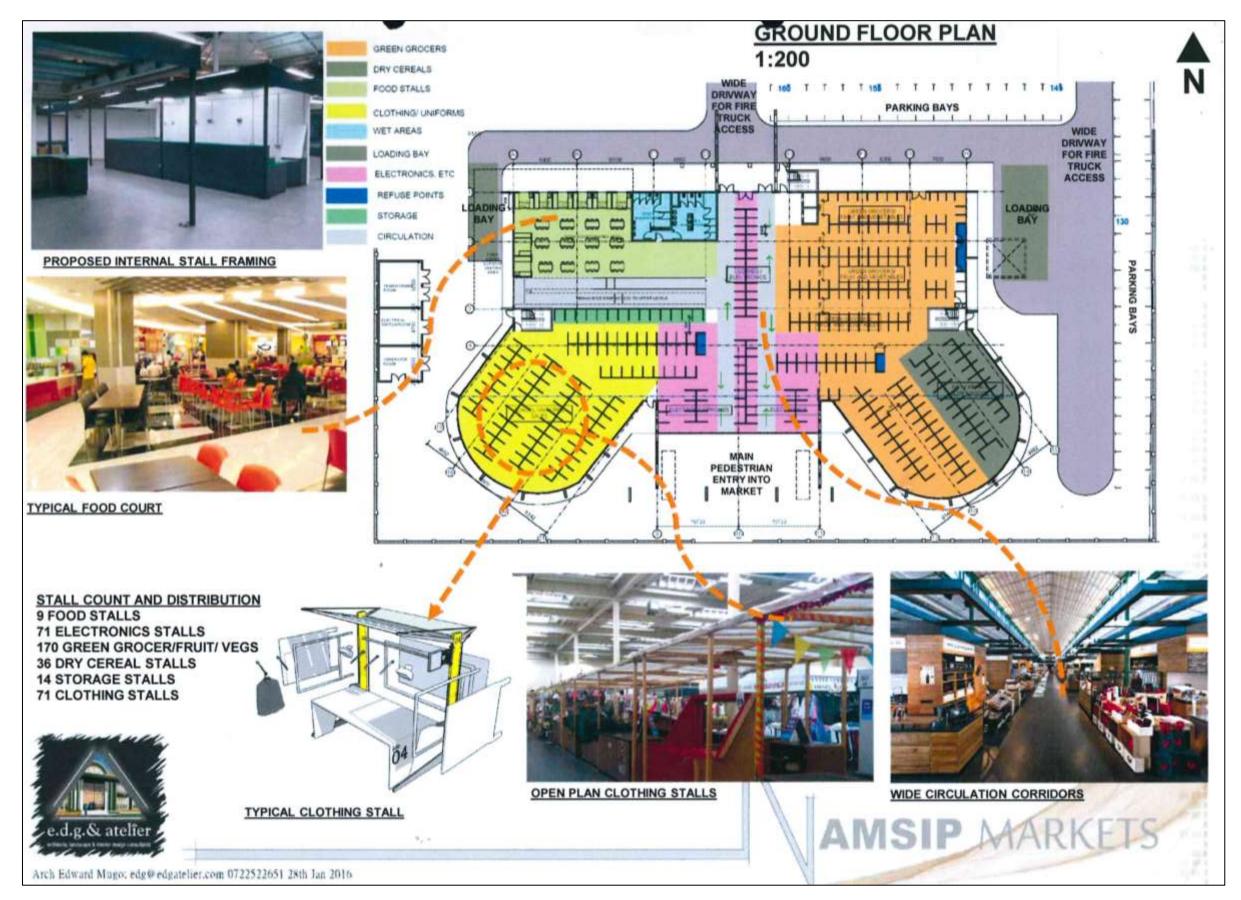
Proposed Ground Floor Plan for Jogoo Road Market Complex
